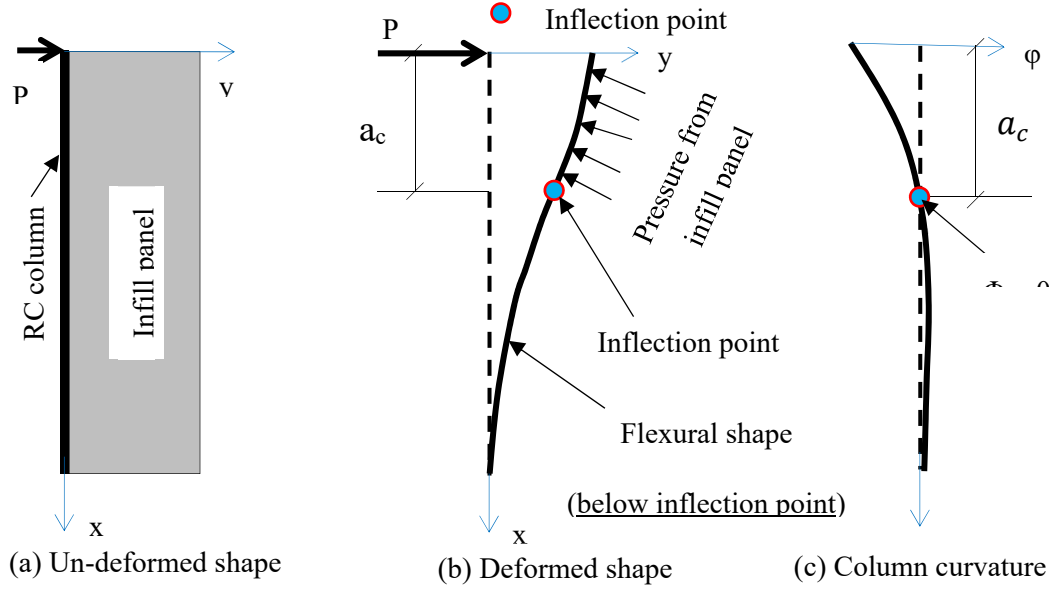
Surrounding RC column (a) un-deformed shape, (b) deformed shape and (c) curvature distribution
